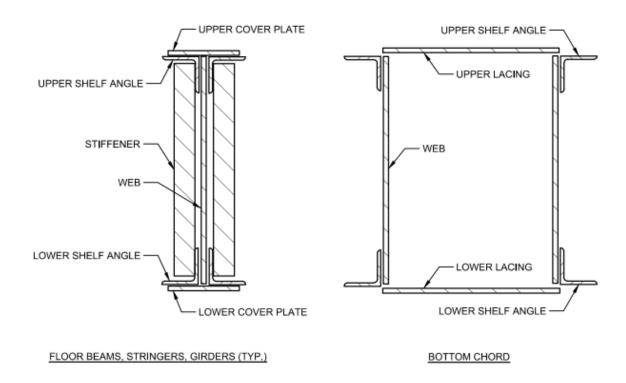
Cross Sections of Typical Built-Up Sections in Structure 104
